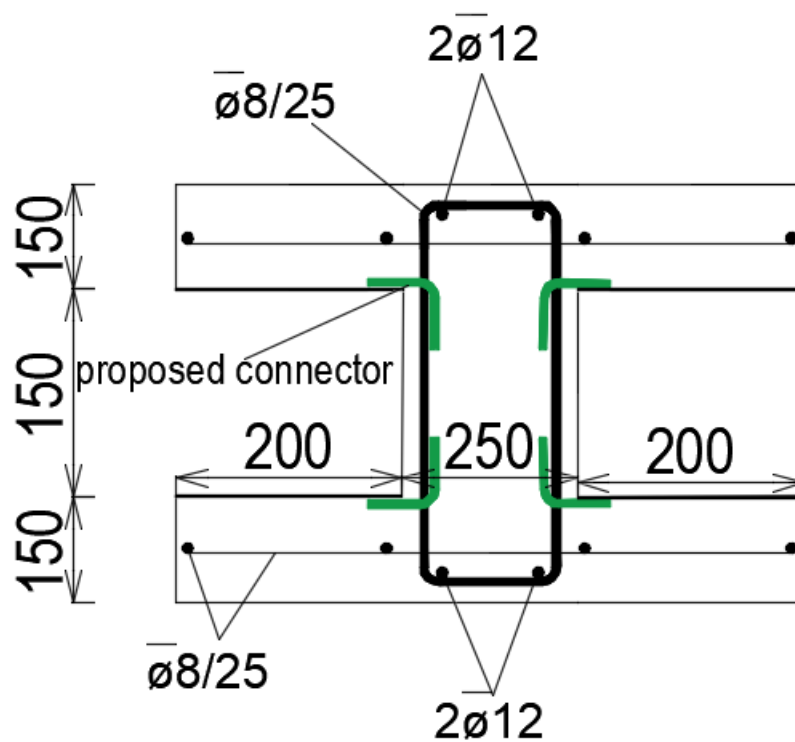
Cross-sectional dimensions and reinforcement for specimen SC-FR.
